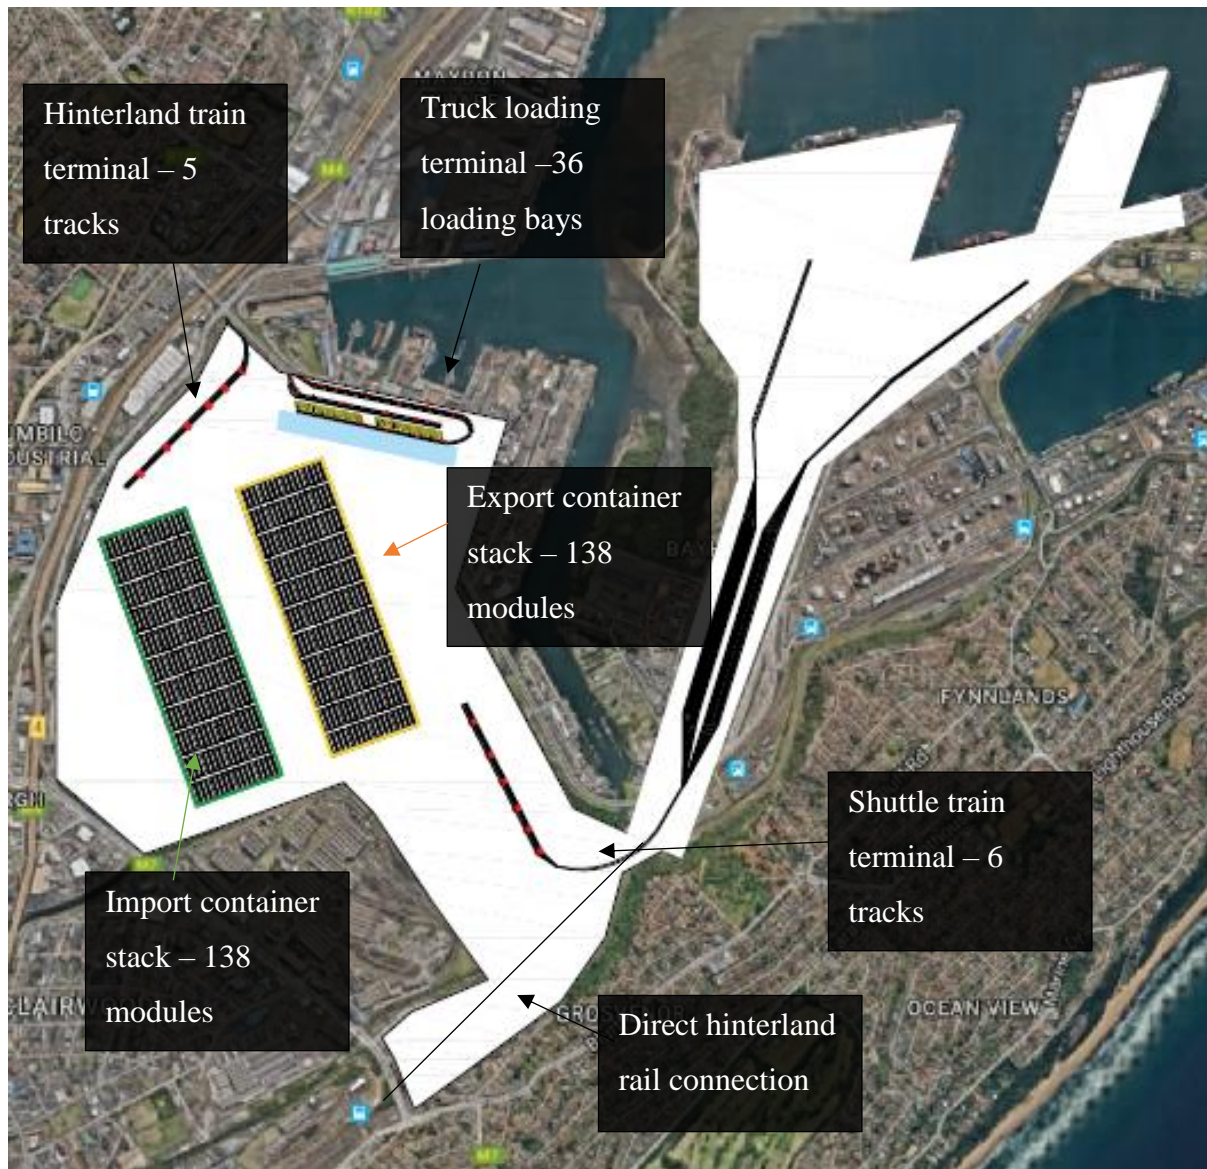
Layout of Bayhead Road site, adapted from Google Earth (2016)
